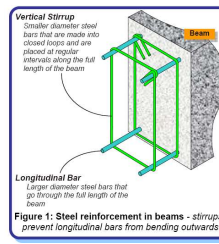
Steel reinforcement in beams - stirrups prevent longitudinal bars from bending outwards.
